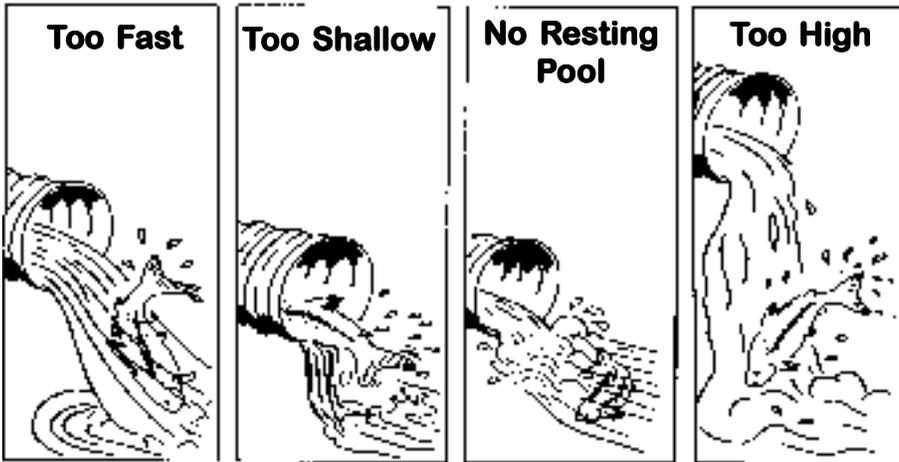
Poorly designed or installed culverts with “fish barriers” that prevent fish passage. (Redrawn from Evans and Johnston 1980)
